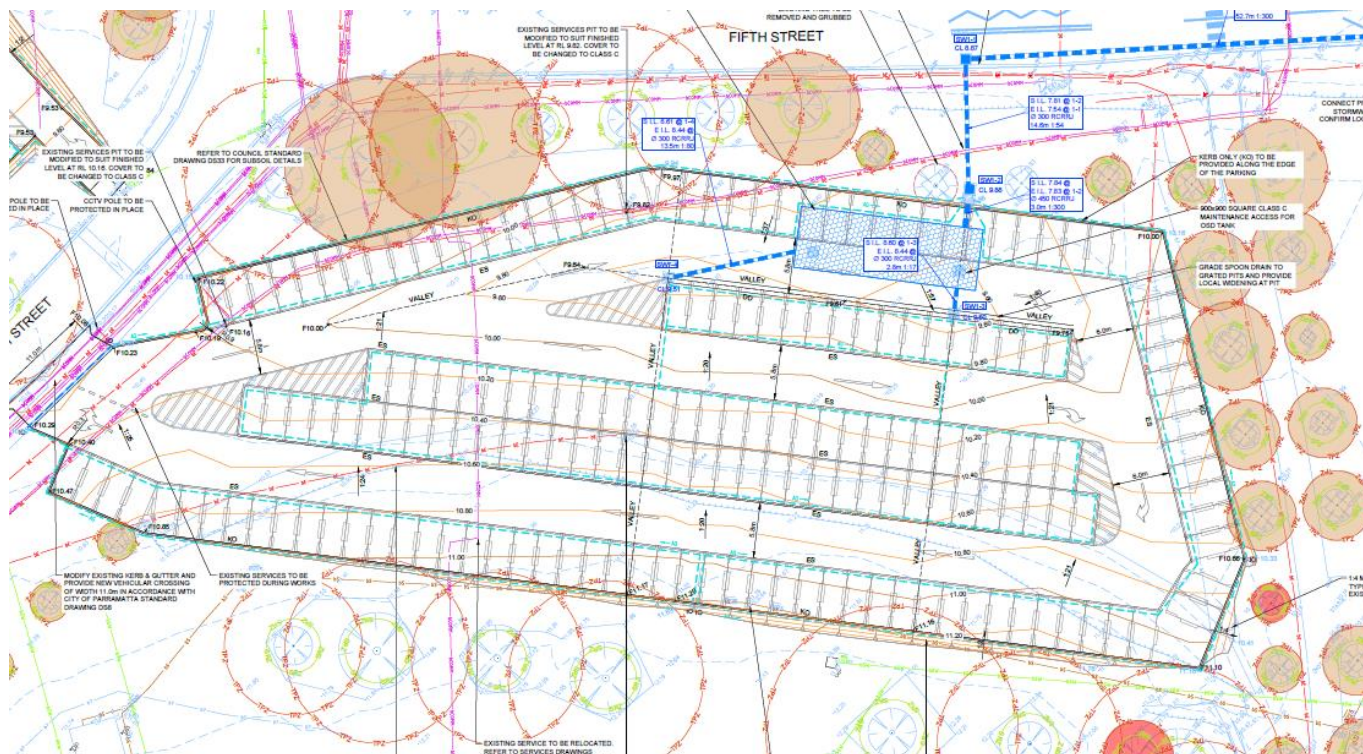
Stormwater and Drainage Detail – Eastern Car park
